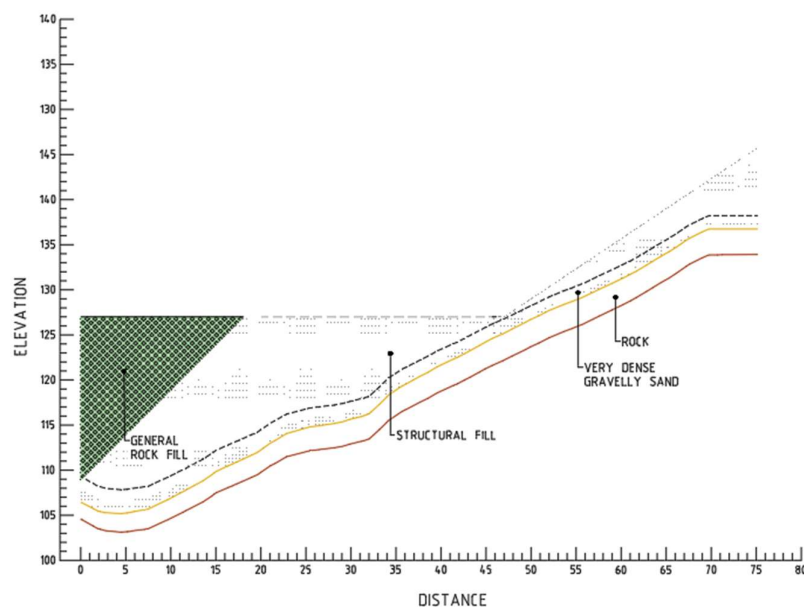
Typical cross-section of existing ground condition prior to the retaining wall construction
